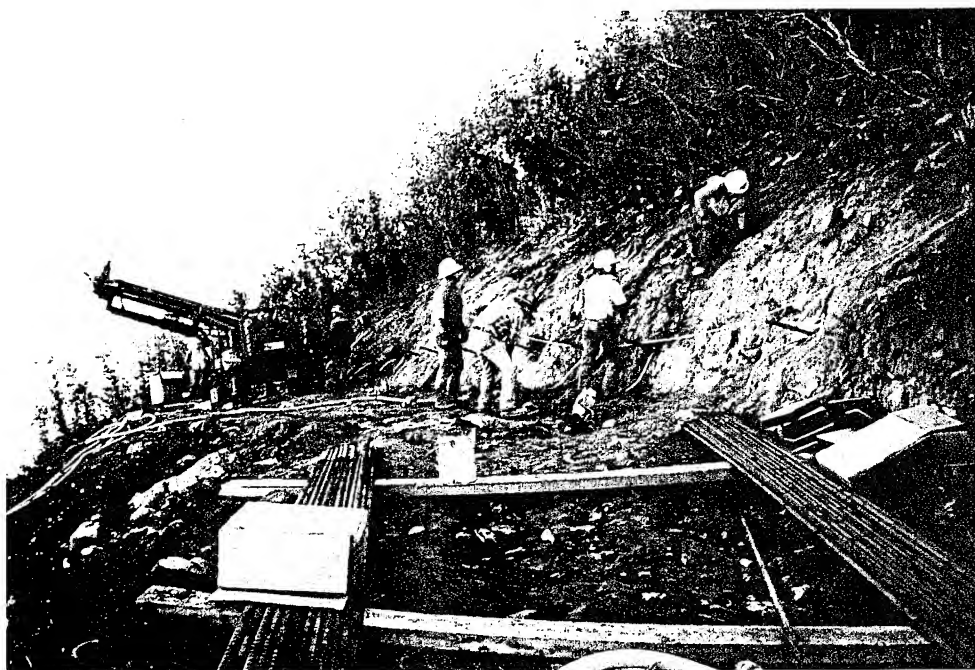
Downstream Portal. Crew using an air line to clean anchor holes before installing anchor bars and cement. Anchor bars can be seen in foreground.
